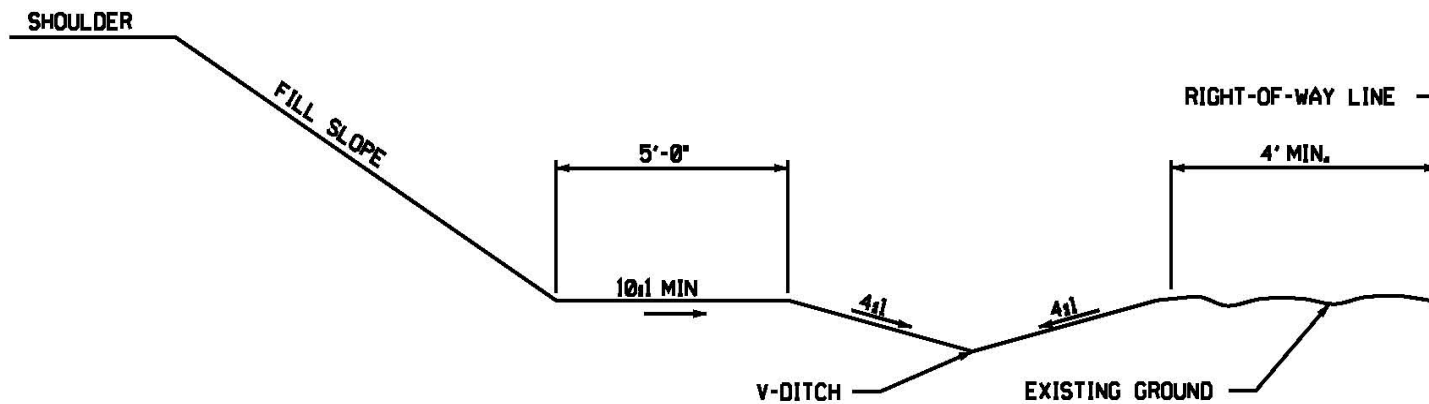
(B) TYPICAL DITCH - FILL SLOPE
